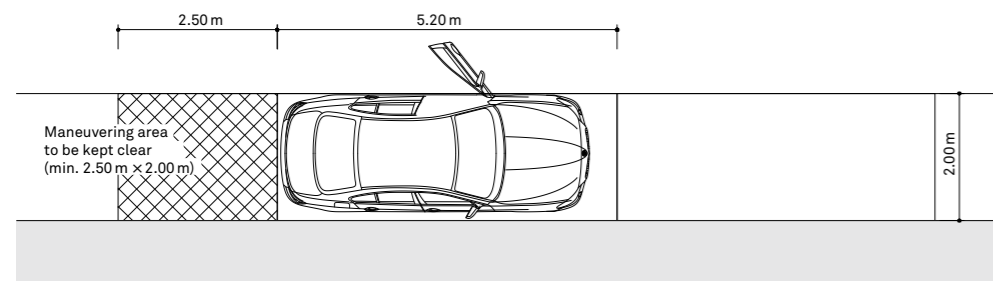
Dimensioning of parking stalls for wheelchair users – parallel parking
